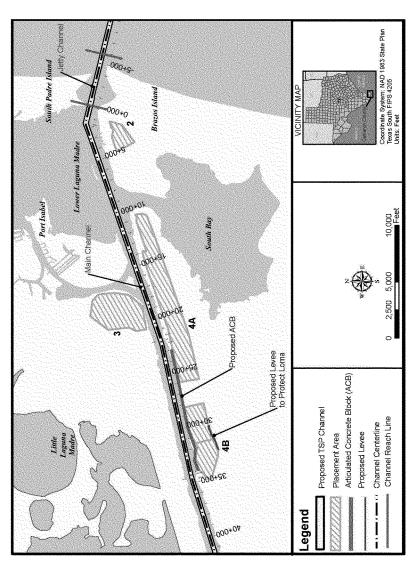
Recommended Plan - Jetty Channel to Main Channel
